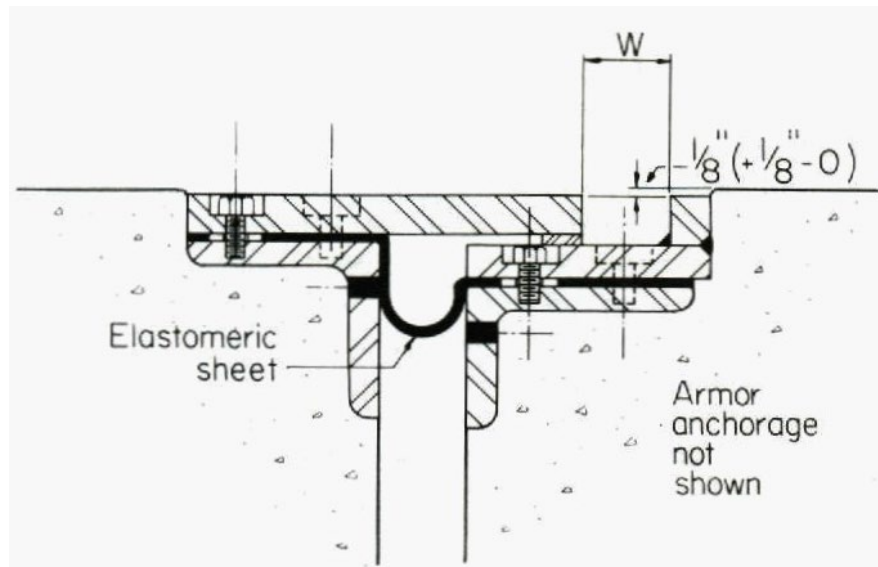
Cross Section of a Sliding Plate Joint
